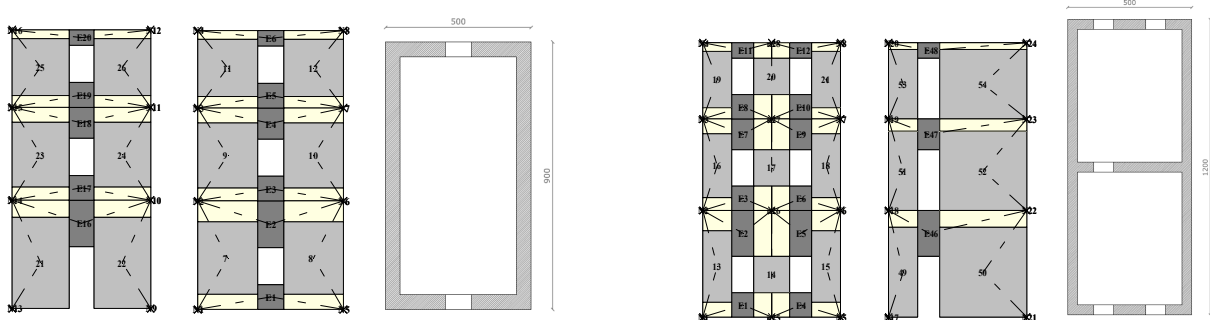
Structural units: front and back façades, longitudinal internal wall models and plans of both typologies
